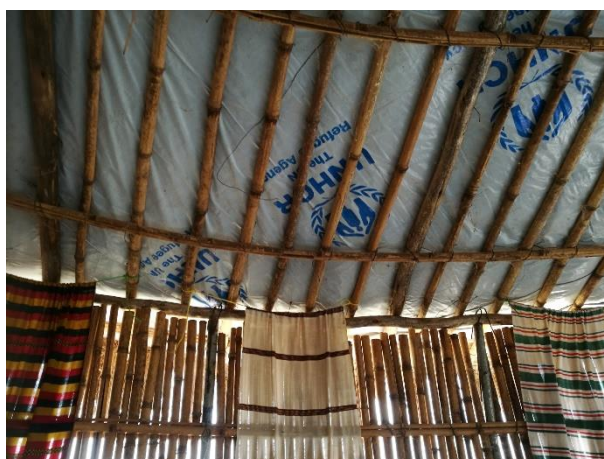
UNHCR sheet used under roof in ARRA office, Photo: Engineers Without Borders
